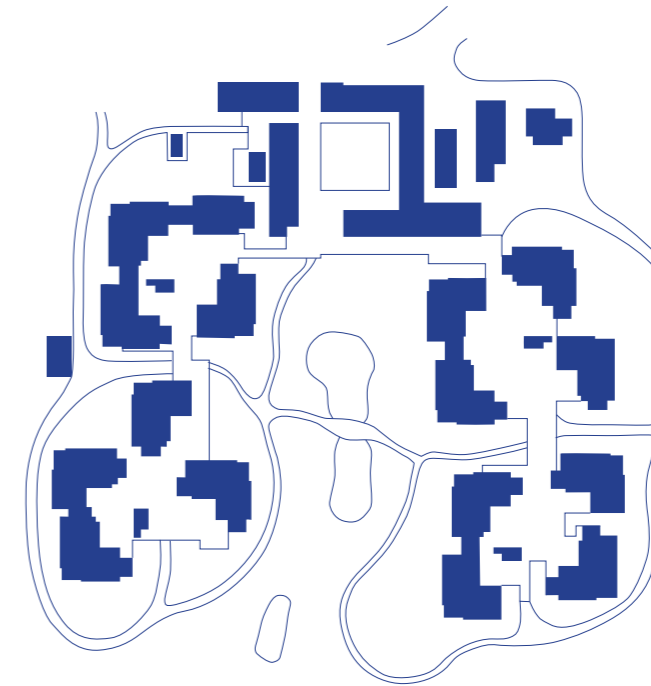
Concept floorplan of Alzheimer Village Dax (own image)
